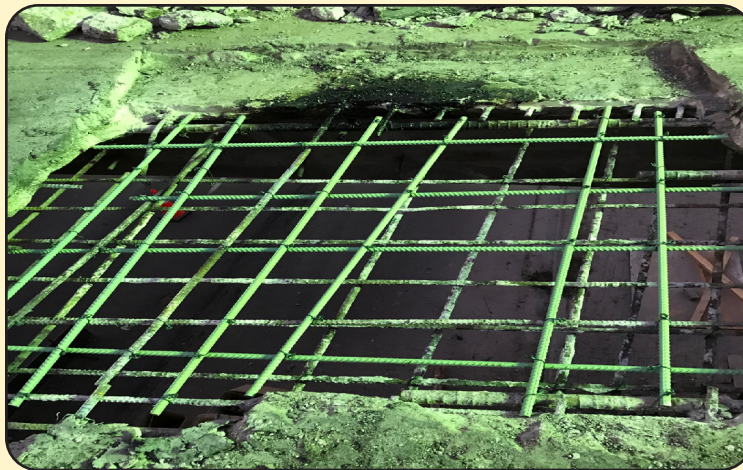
& 4. Deteriorated Concrete on I-76 over York Street in Adams County
